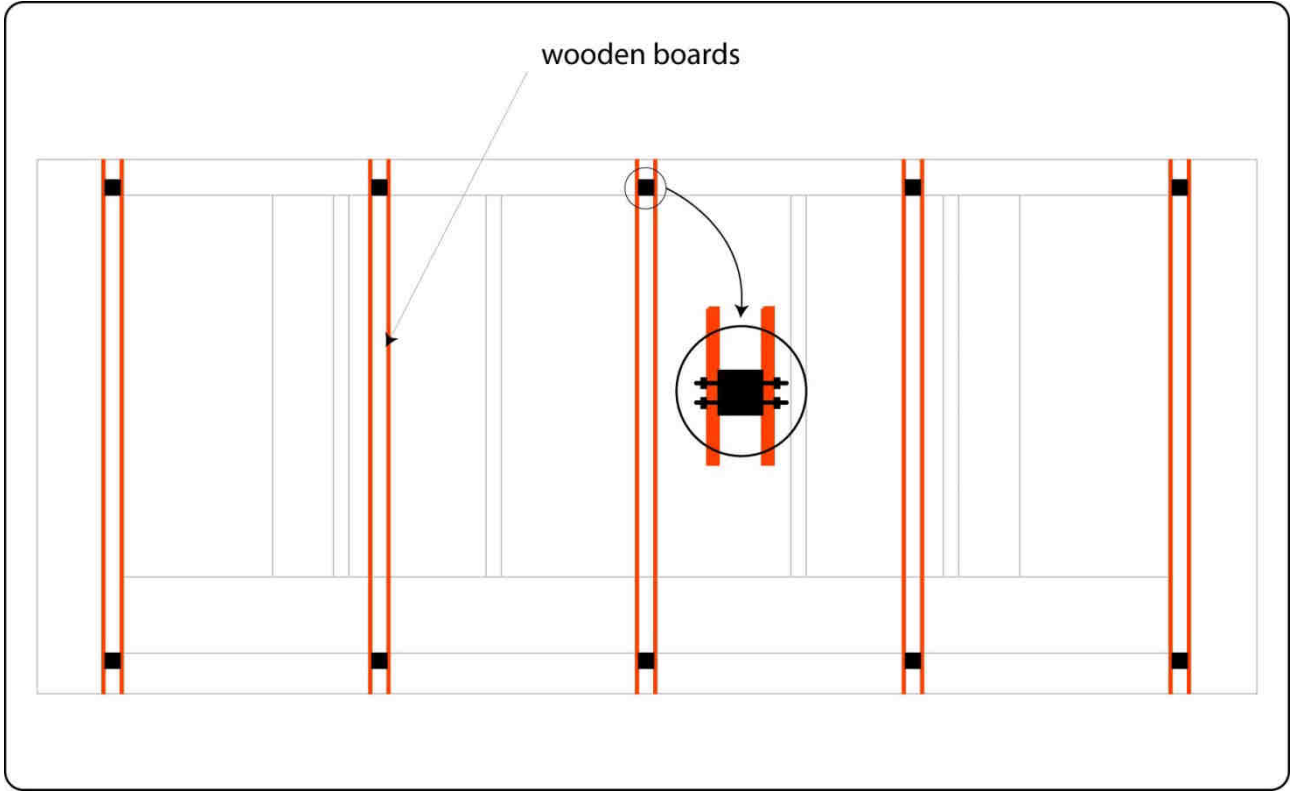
Second step is to fix the traverse wooden boards with threaded bars and bolts (see detail in the picture) at the concrete support.
